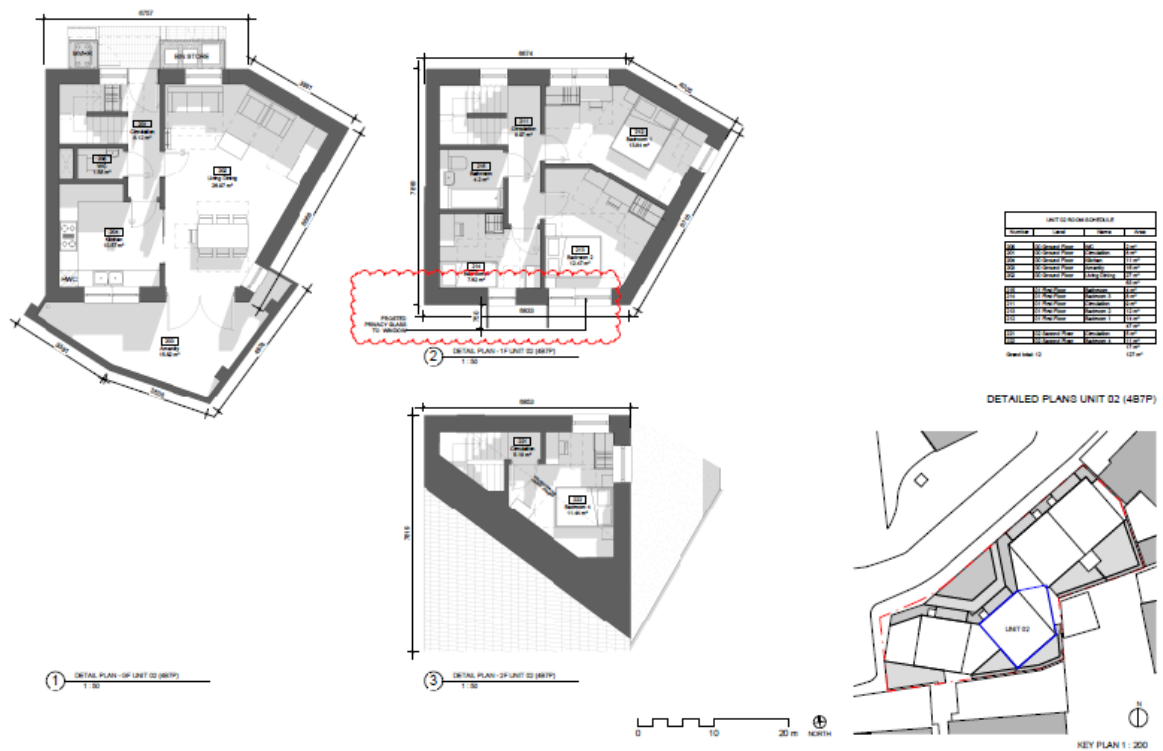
Proposed Unit 2 (Bedroom 2) window to be obscure glazed.
